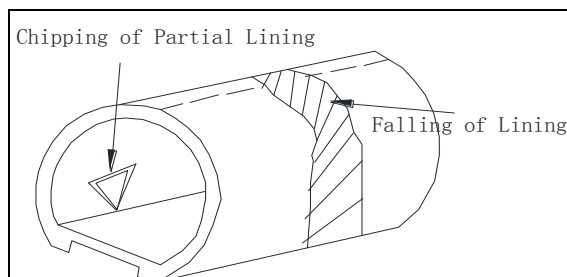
Side Wall Damage in Hole of Longchi Tunnel
